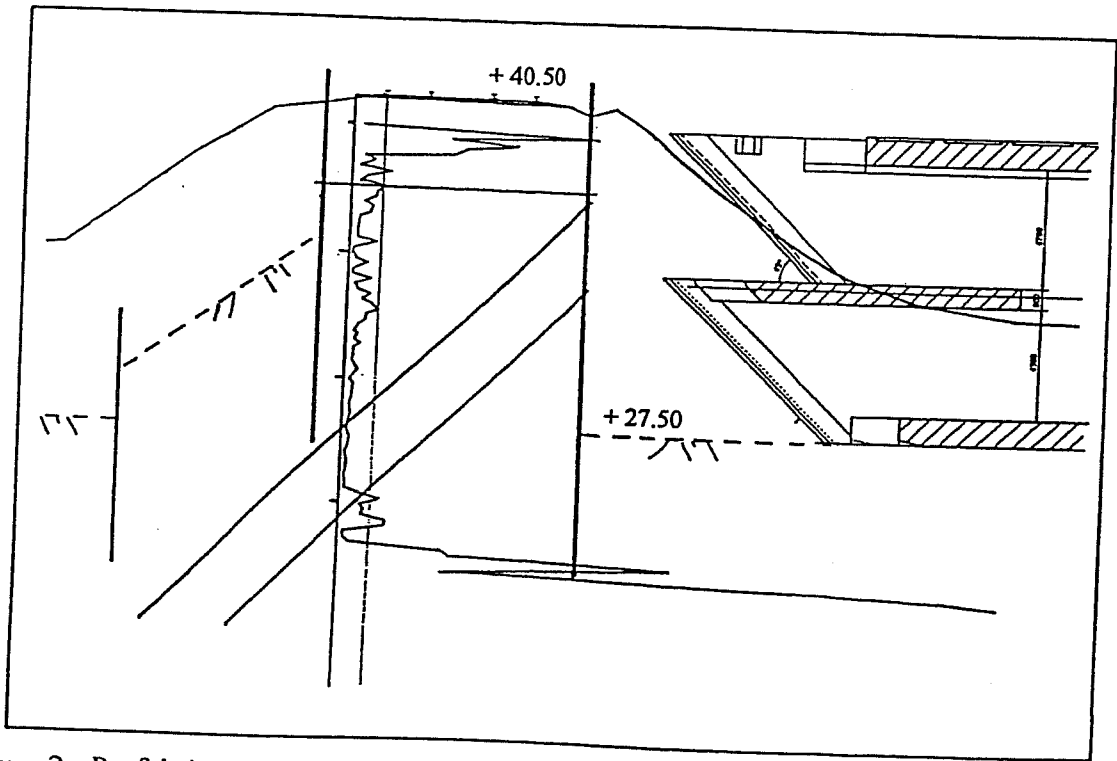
Prefabricated tunnel, sheet pile walls of the jacking and receiving pits and CPT.
